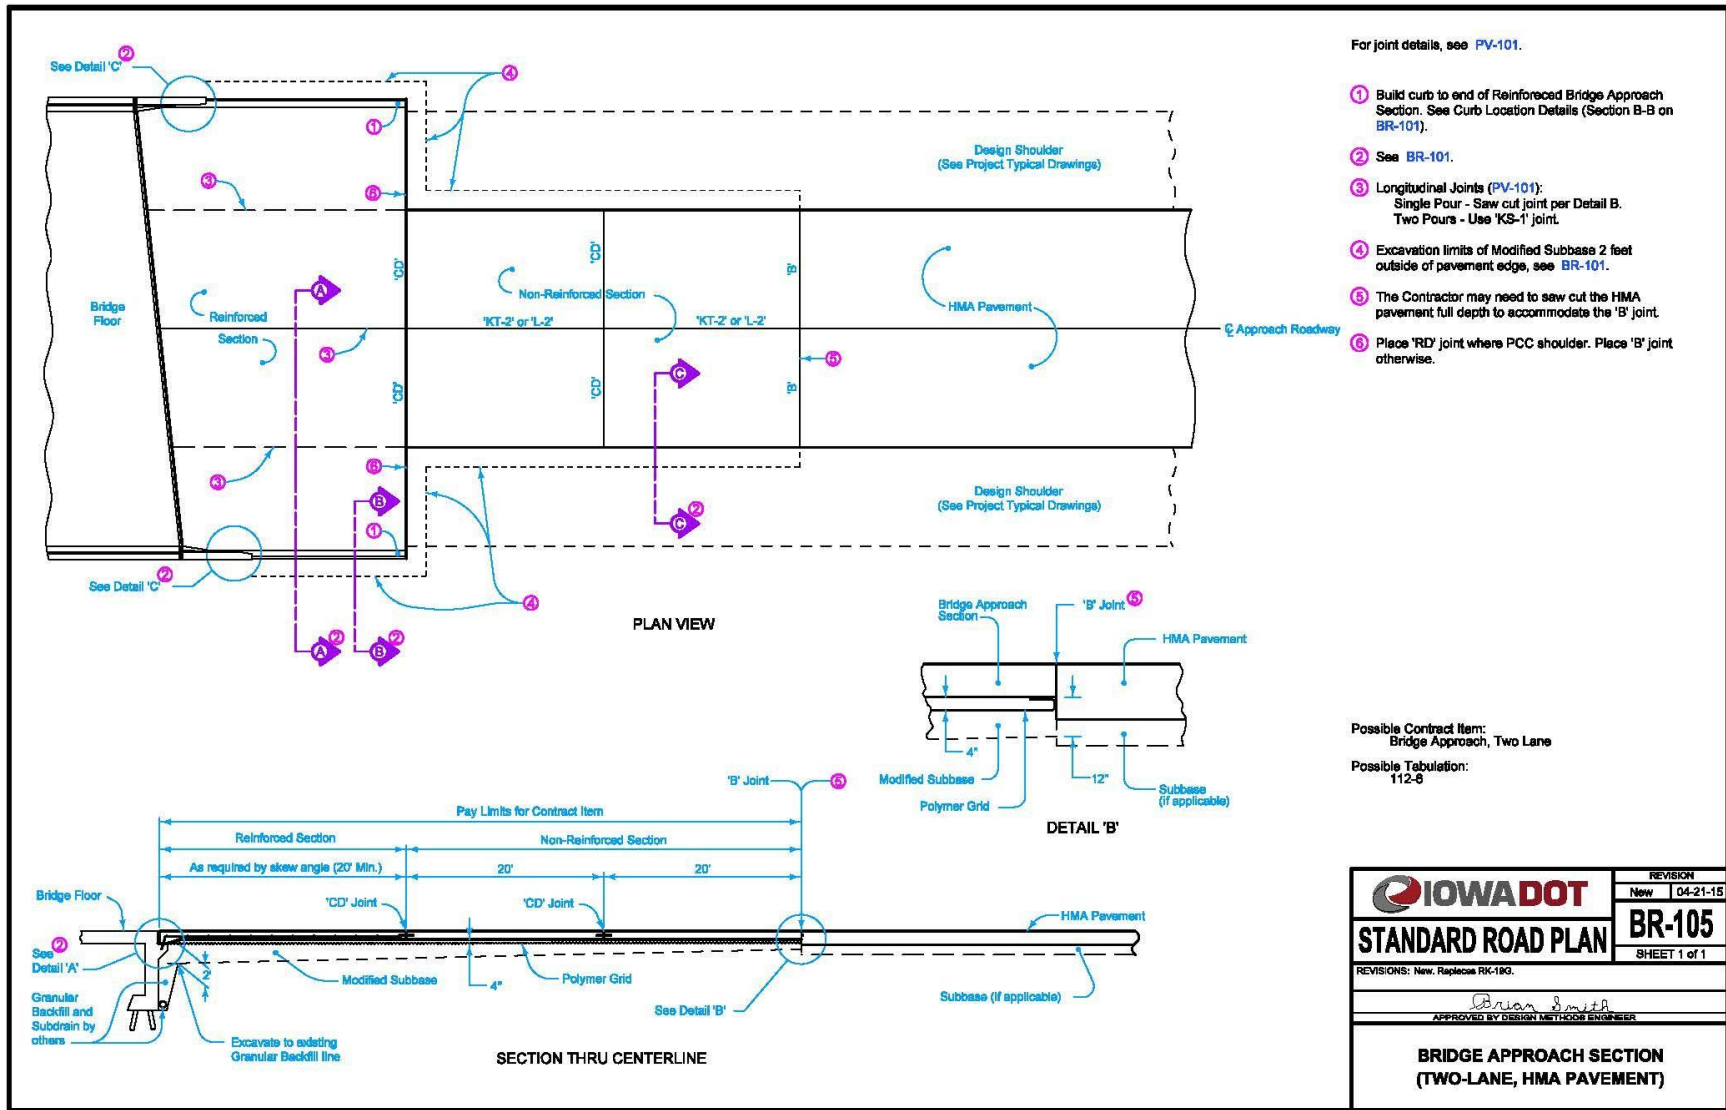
Iowa DOT Standard Road Plan BR-105 – Bridge Approach Section (Two-Lane, HMA Pavement) [68]
